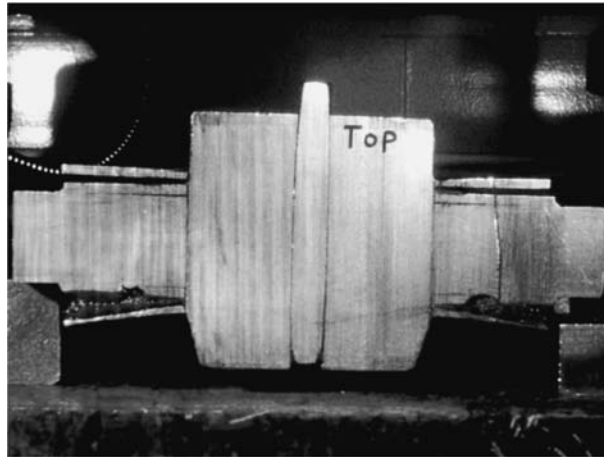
Cross-section through pin, web and spacer washers showing corrosion packout.
